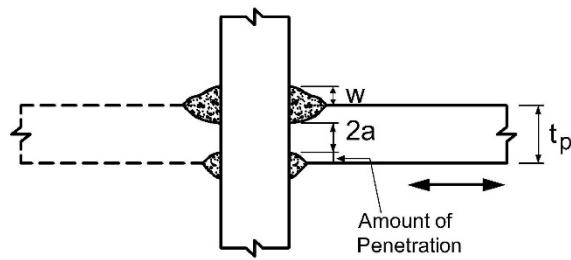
Loaded Discontinuous Plate Element Connected by a Pair of Partial Joint Penetration Groove Welds
